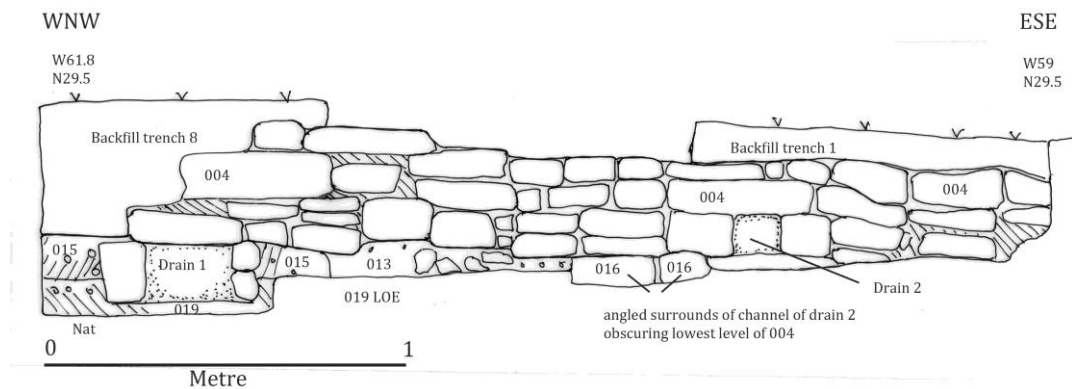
Section drawing 150 of north wall of rectilinear building (21/004), showing drains 1 and 2 channels
